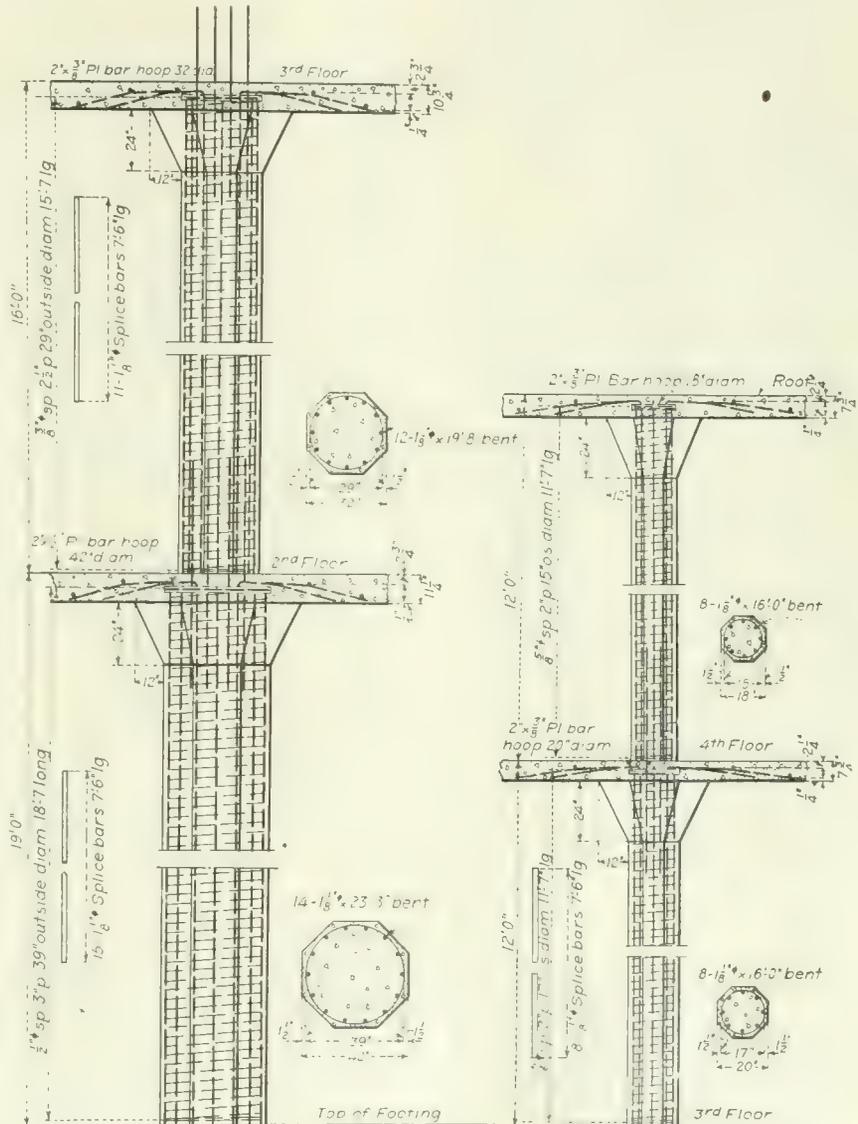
Elevation and Cross Sections of Typical Interior Column in Warm Storage Section of Warehouse.
